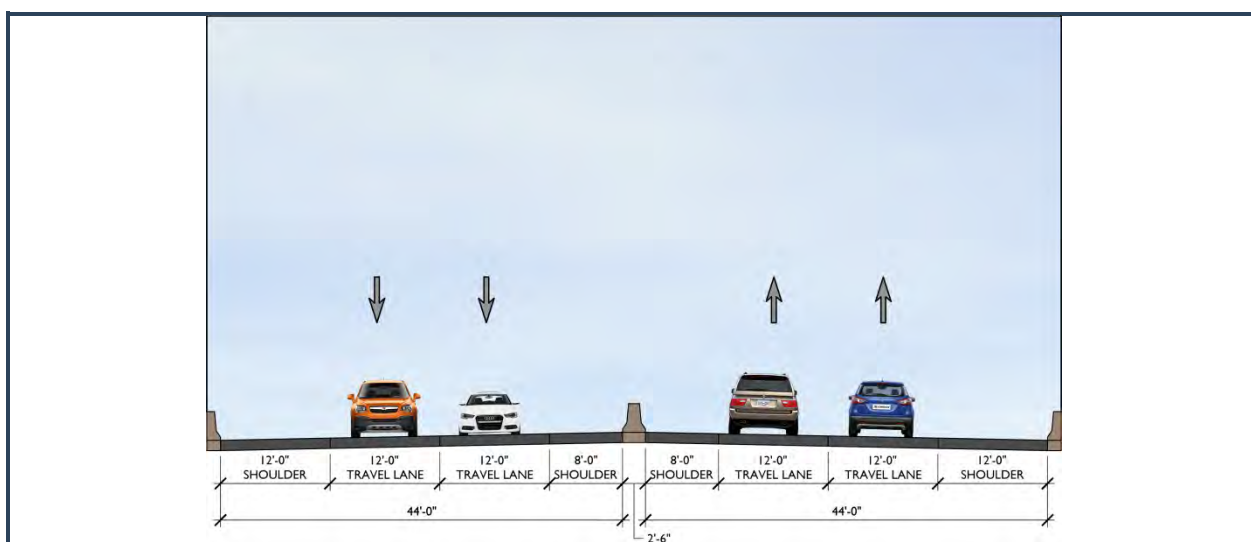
West Alternative 1 – Elevated near Watson Lane
